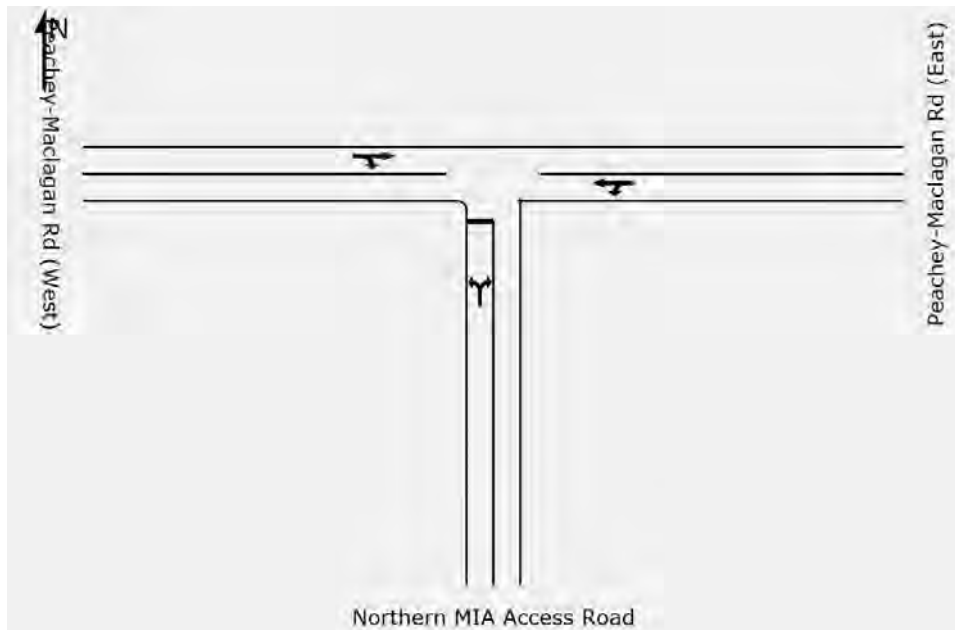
D: Existing intersection layout – Peachey Maclagan Road/ Northern MIA Access Road
